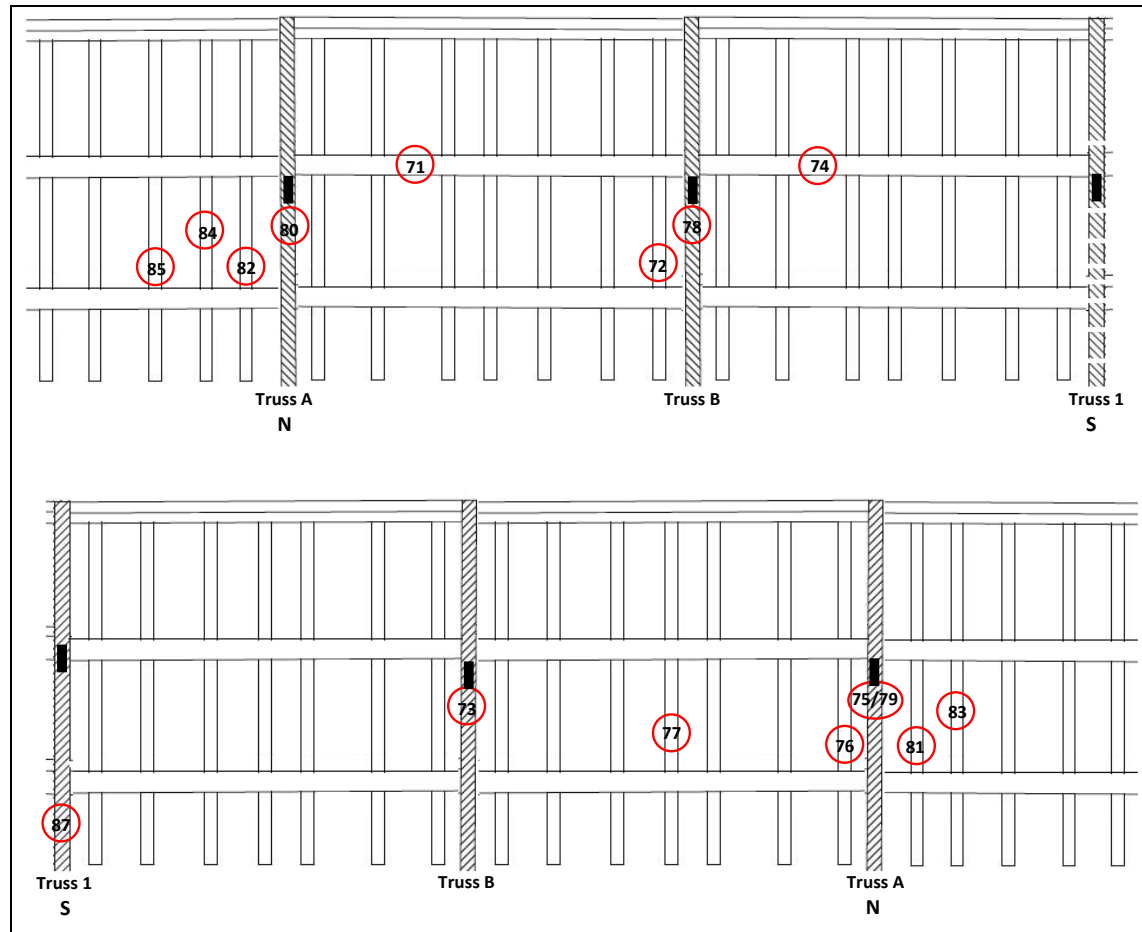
9a The Close (roof 2); long-sections through trusses A-B to show sample locations (after John Allan, Exeter Archaeology)
